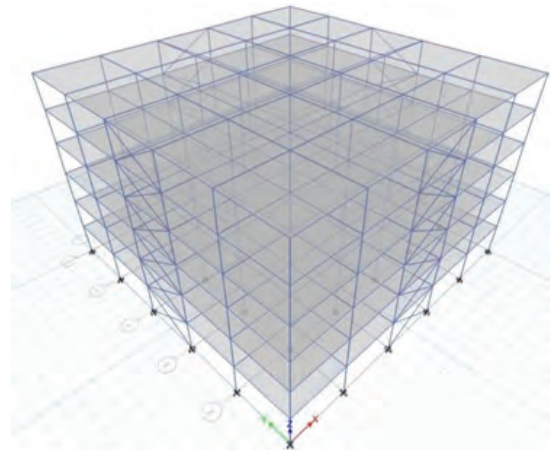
3D model of G+5 storey building with X-pattern BRBs at the centre of building
